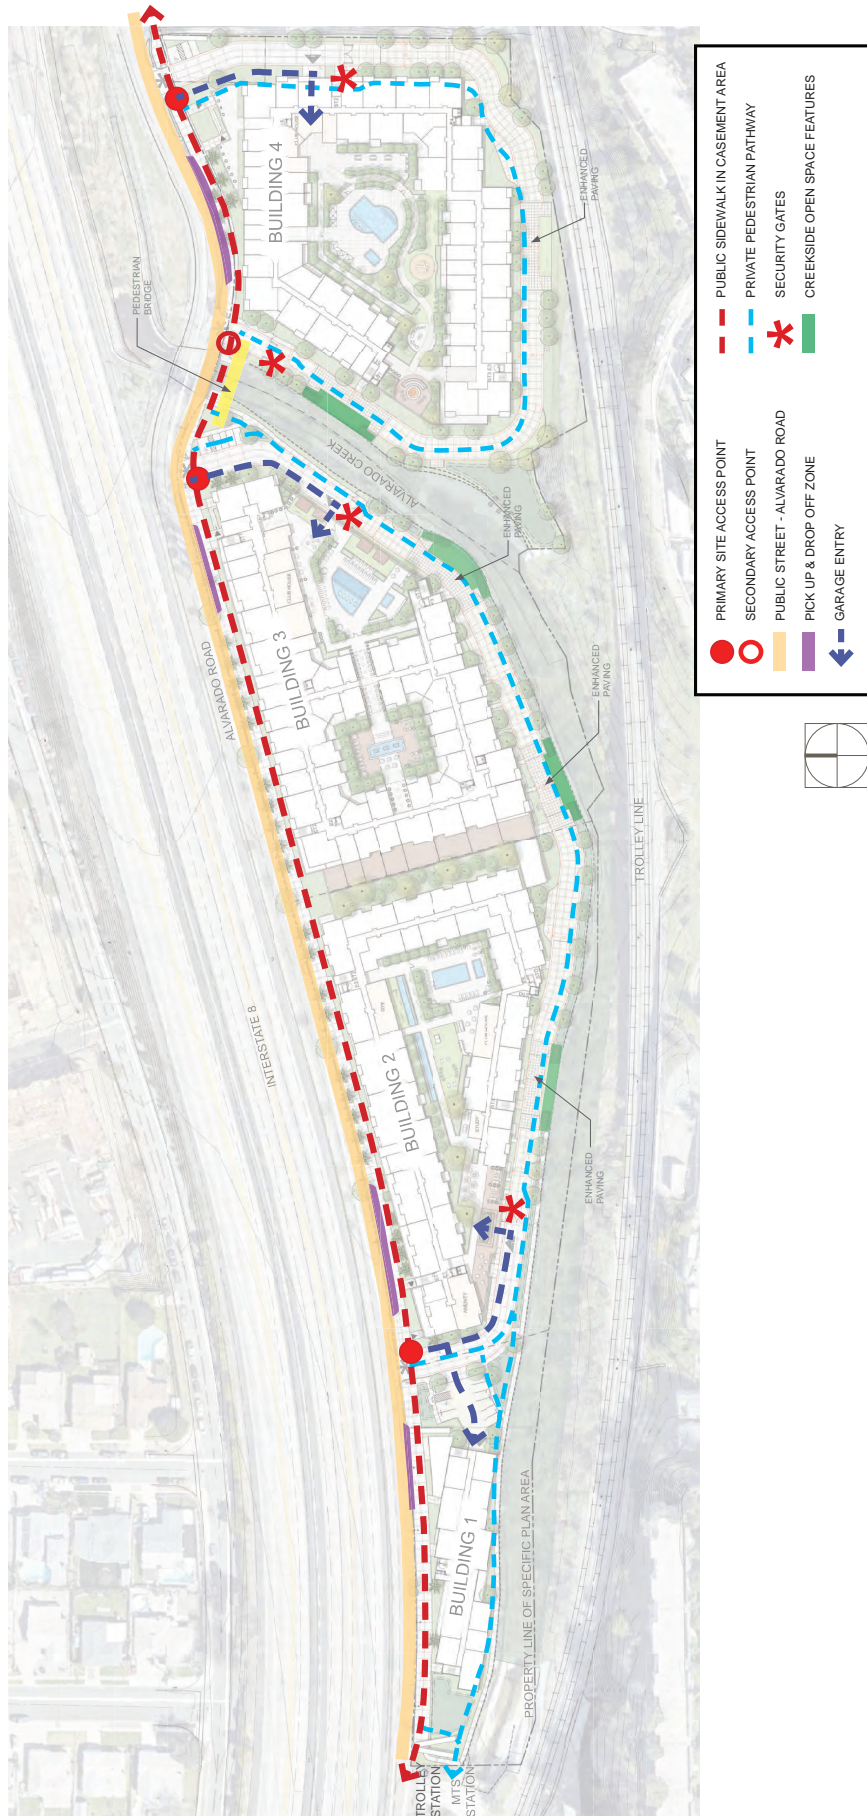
Plan View of Interior Street Circulation and Mobility Plan
